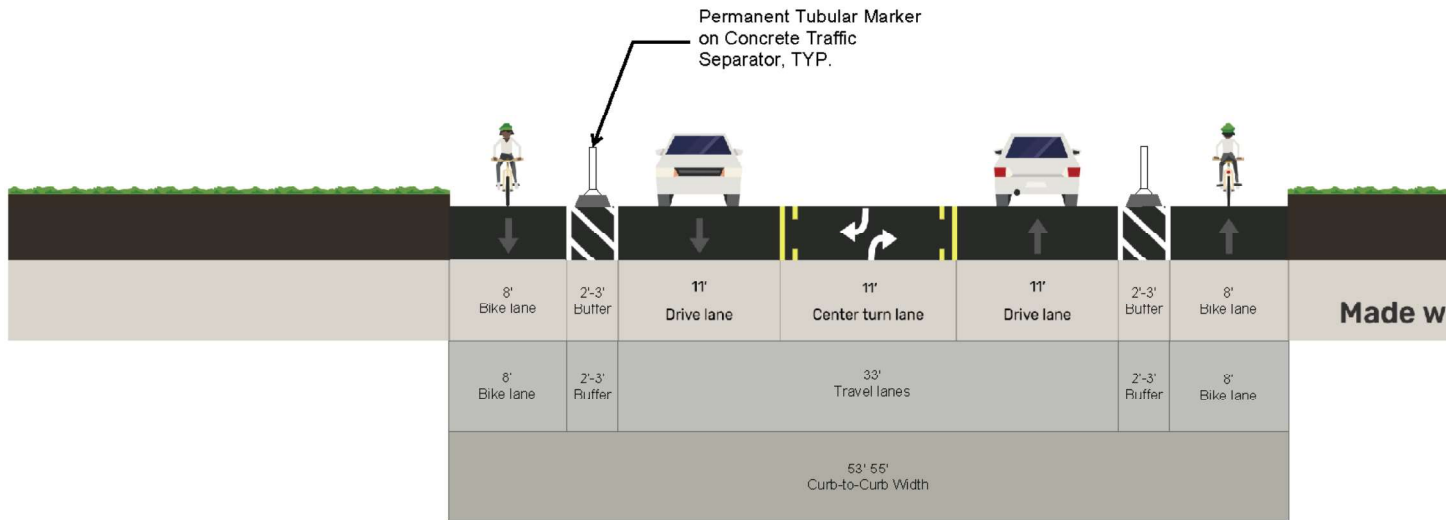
TYPICAL CONSTRAINED CROSS-SECTION OPTION, 53'-55' CURB-TO-CURB WIDTH (LOOKING EAST)
